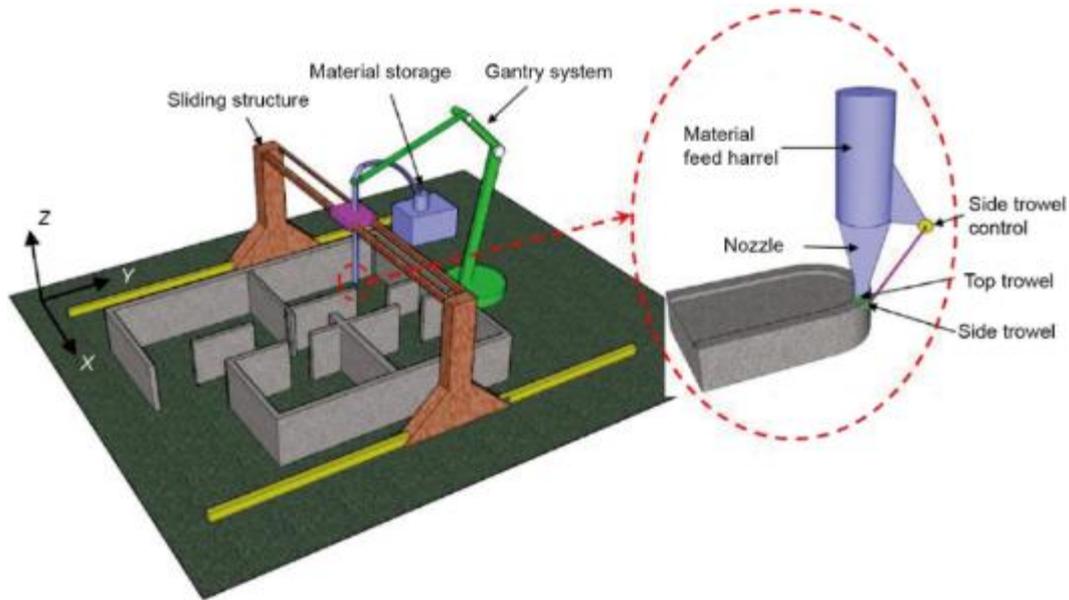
A Gantry 3D printing system for construction of a house (Sanjayan, Nazari and Nematollahi, 2019).
